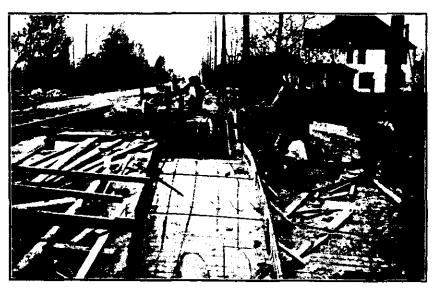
EAST WASHINGTON STREET BRIDGE, INDIANAPOLIS
